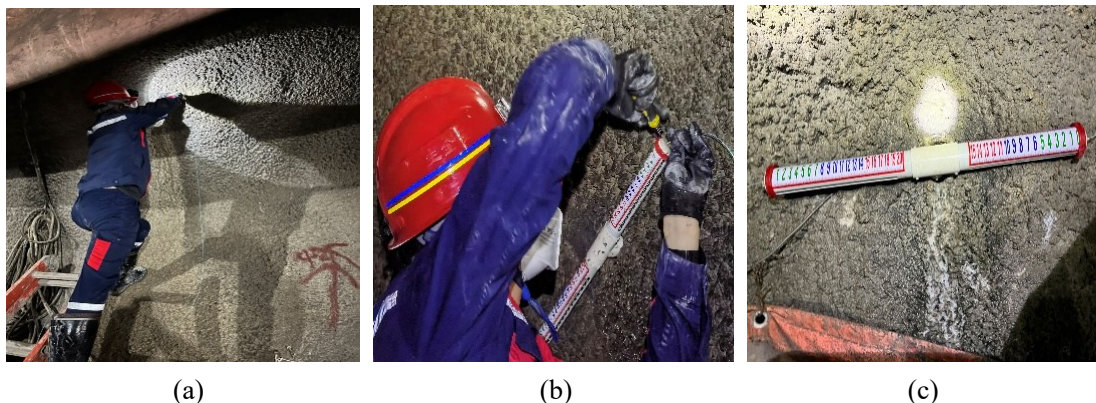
The installation process of the roof separation instrument. (a) Drilling. (b) Installation. (c) Post-installation effect diagram.
